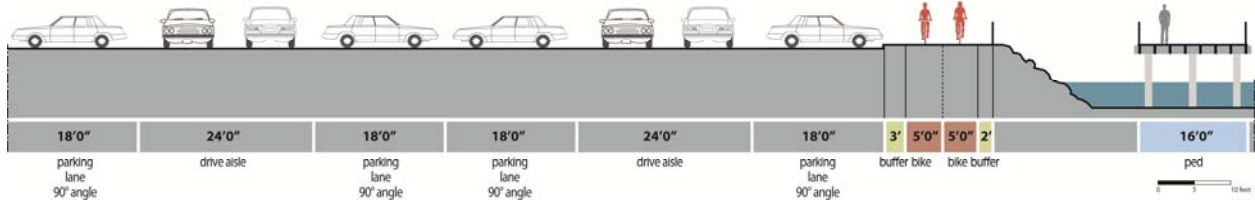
Segment 1C Parking Lot 3 South Proposed Improvements
